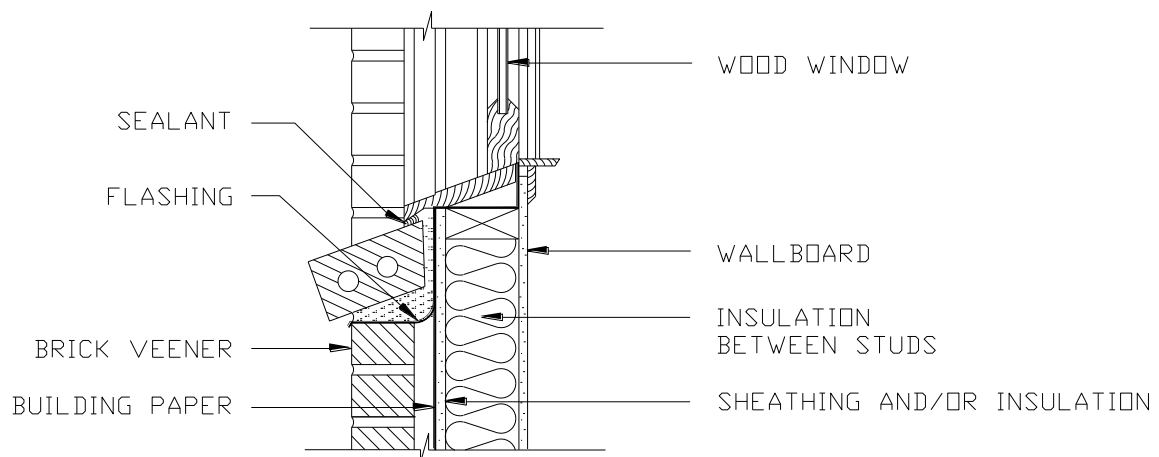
Typical Exterior Brick Veneer Steel Stud Wall System
